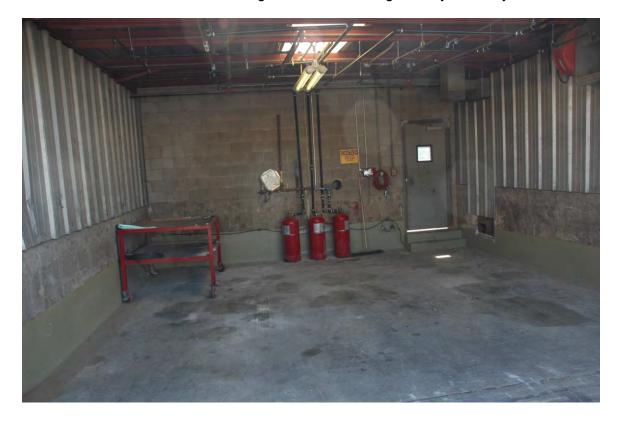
First bay that is proposed for clean-off operation. Floor slopes to rear.
